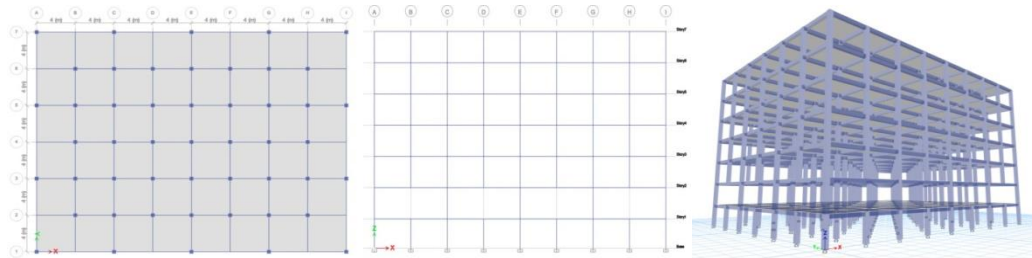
Plan and section of Rectangle building with floating column at bottom corner
